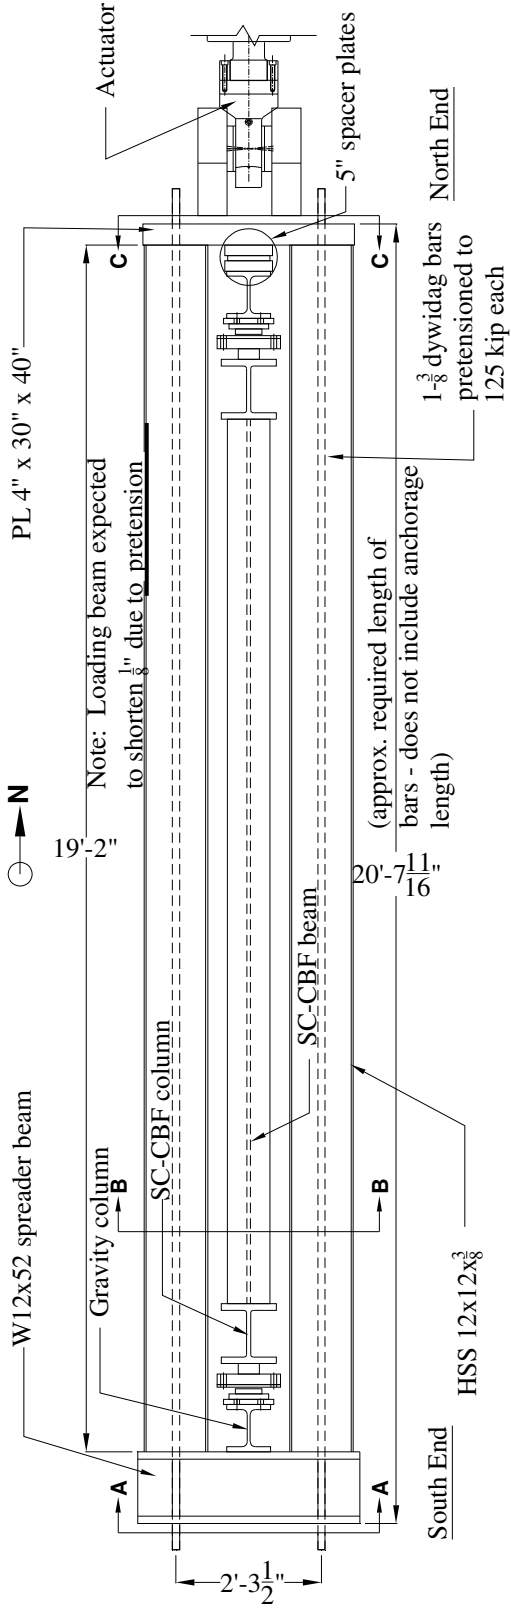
Plan view of loading beam system (Gonner et al. 2010)
